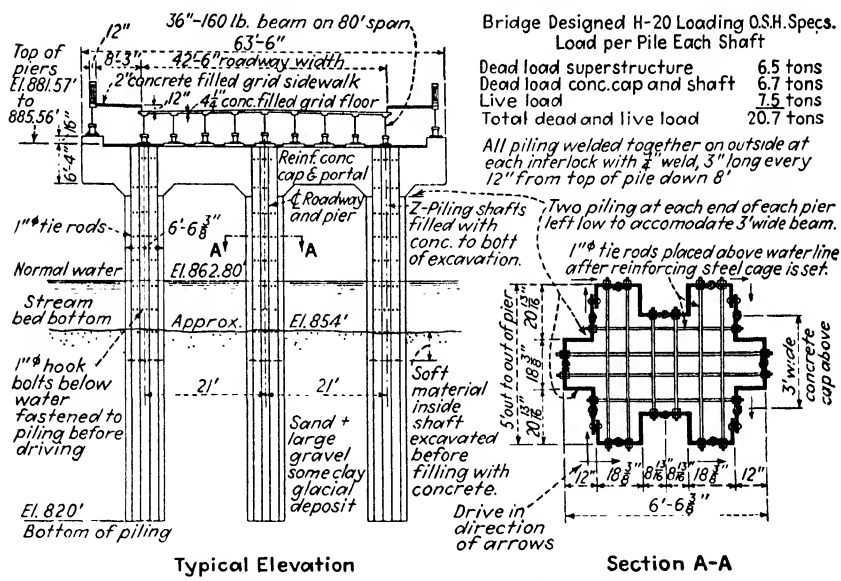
Pier Shafts of Z-piles Filled with Concrete for a Bridge over the Tuscarawas River at Dover, Ohio.
